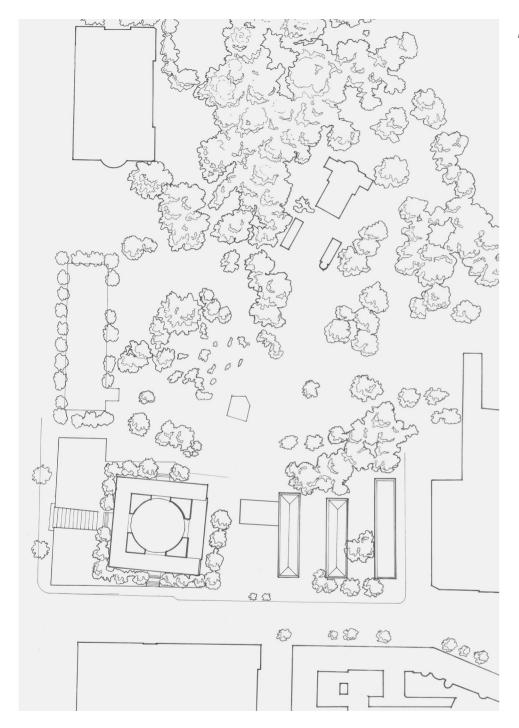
Existing Site Plan, 1:2000 @ A3.
